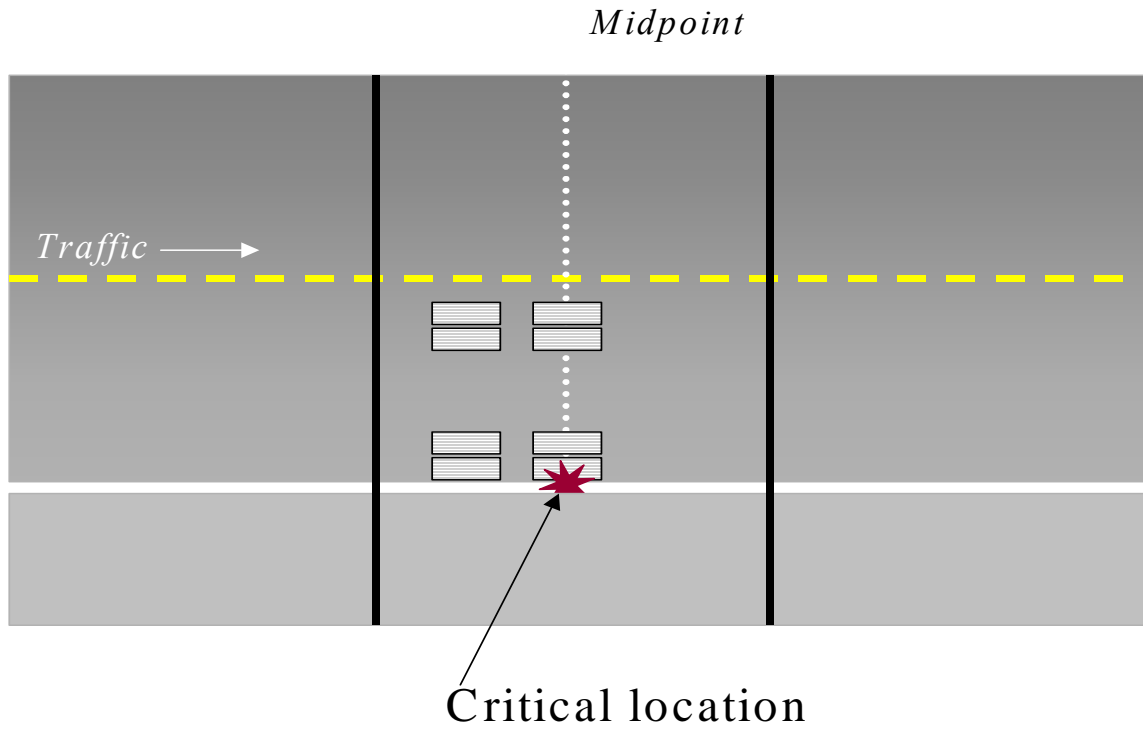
Critical tandem axle position for bottom-to-top cracking.
